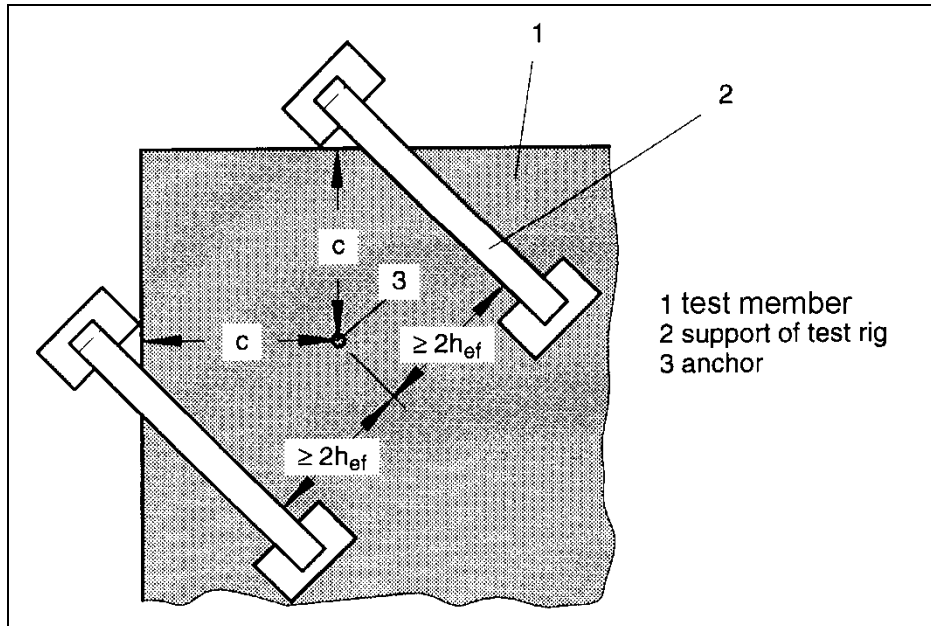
Example of the test rig for tension tests on fasteners at a corner (test series F12)
